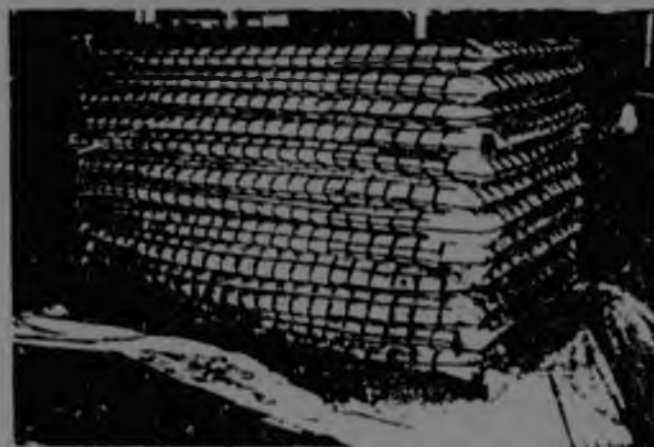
Appearance of a large-scale model wall after being tested to maximum load
